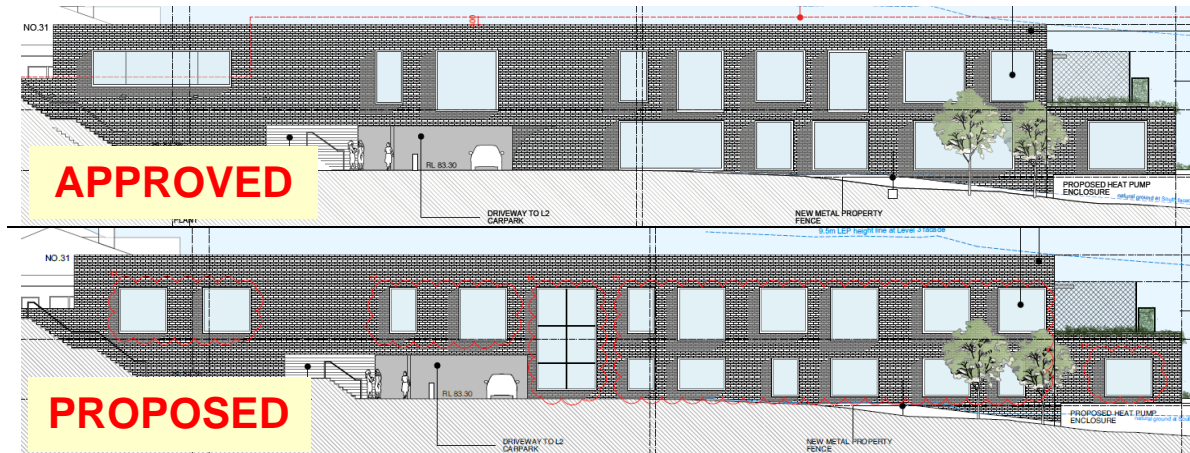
Approved and proposed south (internal) elevation plan, showing modifications to windows
